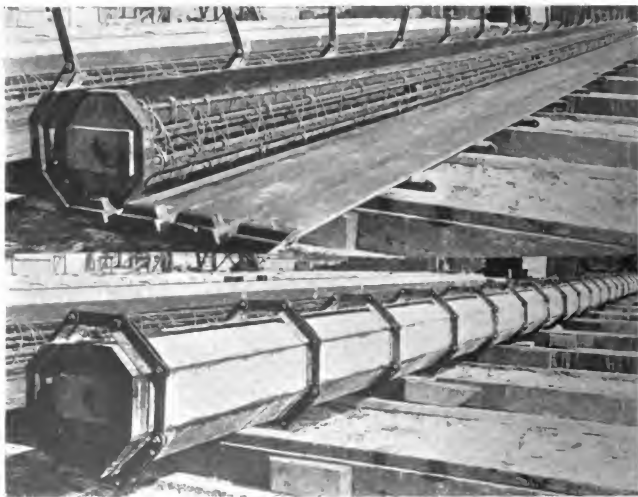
THE UPPER VIEW SHOWS THE FORM "UN-ROLLED," AND THE STEEL IN PLACE.
